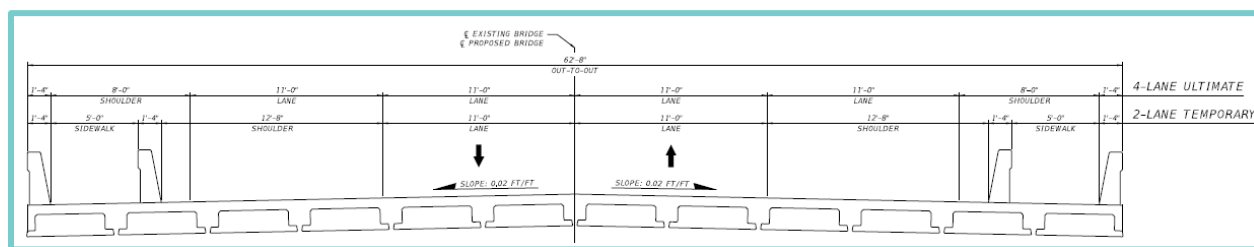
Rural Typical Section, Florida Slab Beam (CIP Continuous Slab Similar)
